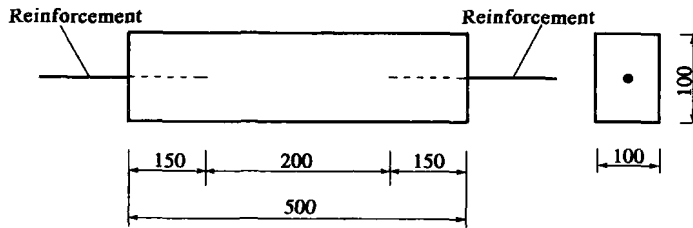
Concrete tensile strength of test specimens (unit: mm)
